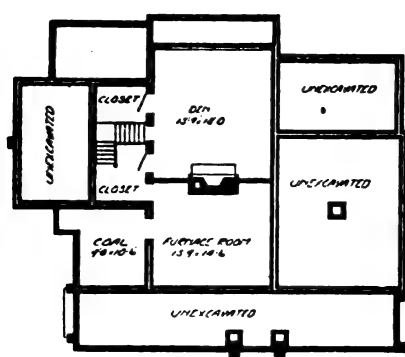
FLOOR PLANS, WACO, TEXAS HOUSE
